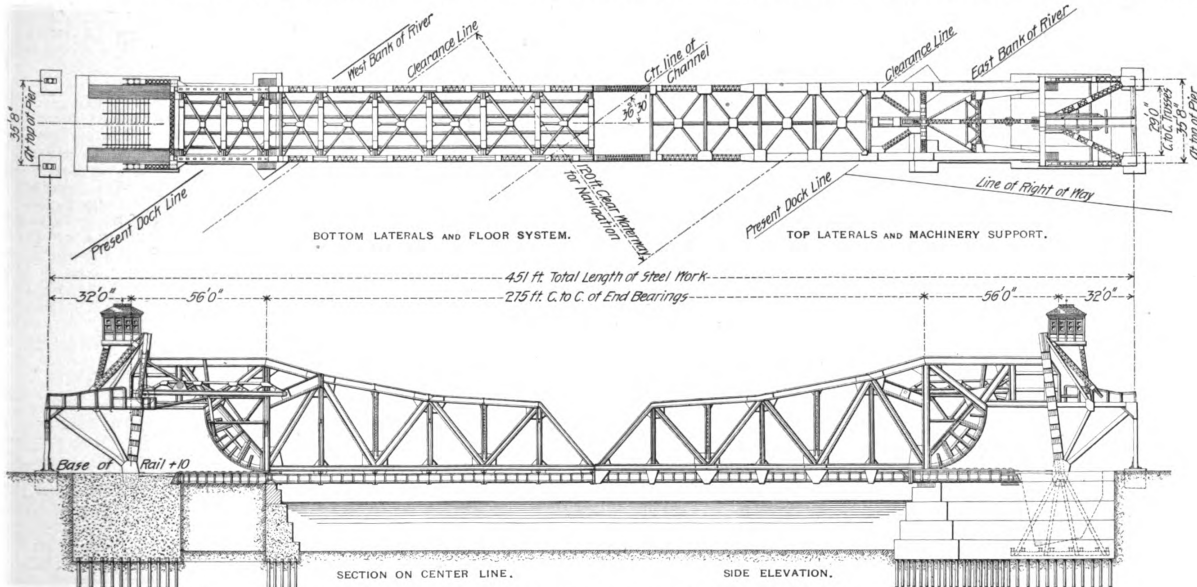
Scherzer Rolling Lift Bridge at Crossing of the Chicago Terminal Railroad.
